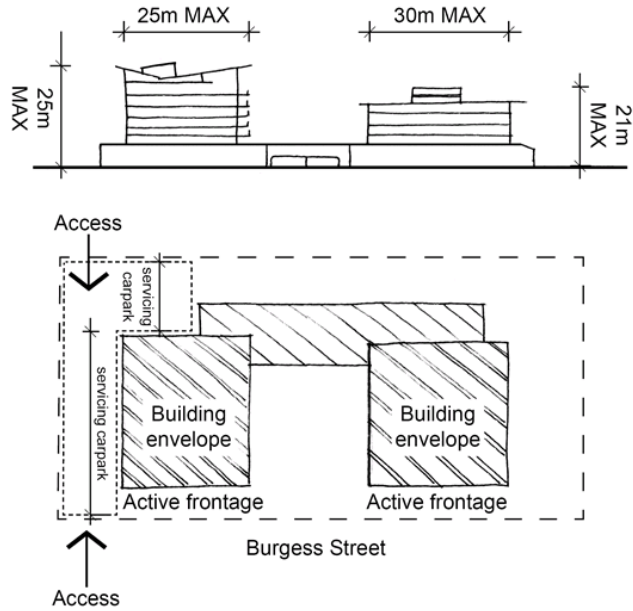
U Example of acceptable single frontage site treatment (parking)
